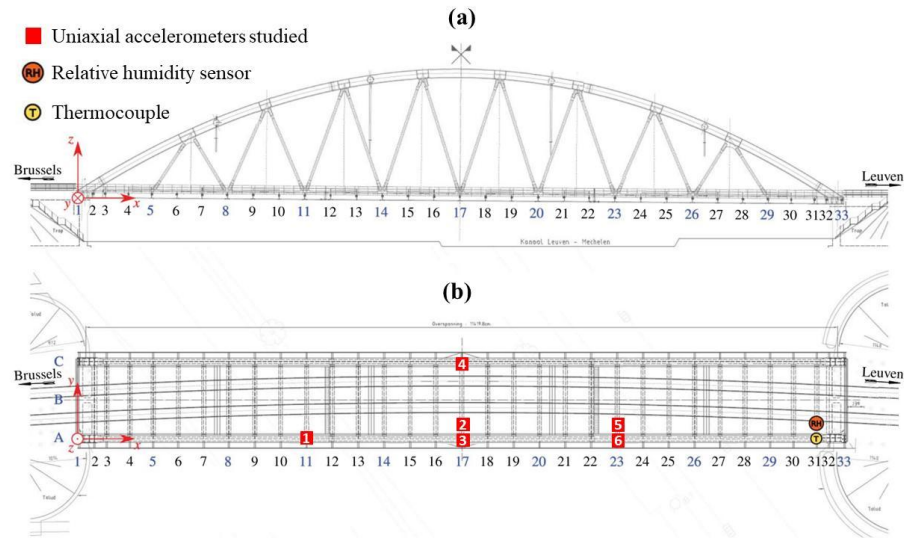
KW51 bridge (a) lateral view; (b) studied accelerometers setup installed on the bridge deck. Adapted from Maes and Lombaert (2021)[52].
